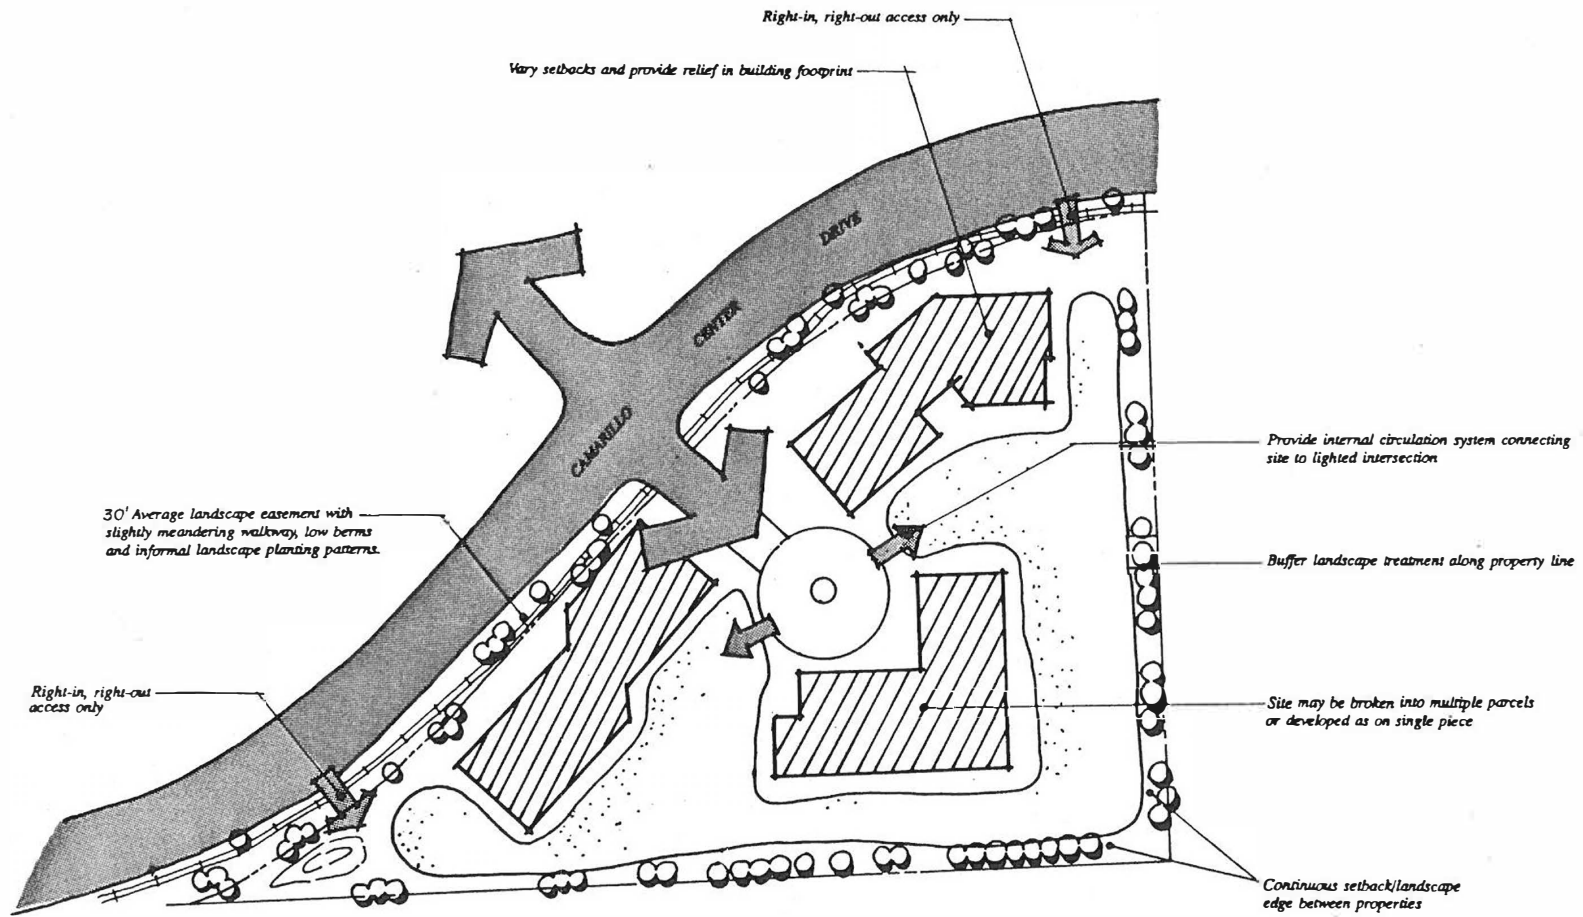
Planning Area IV Site Planning Concept Office/R&D
